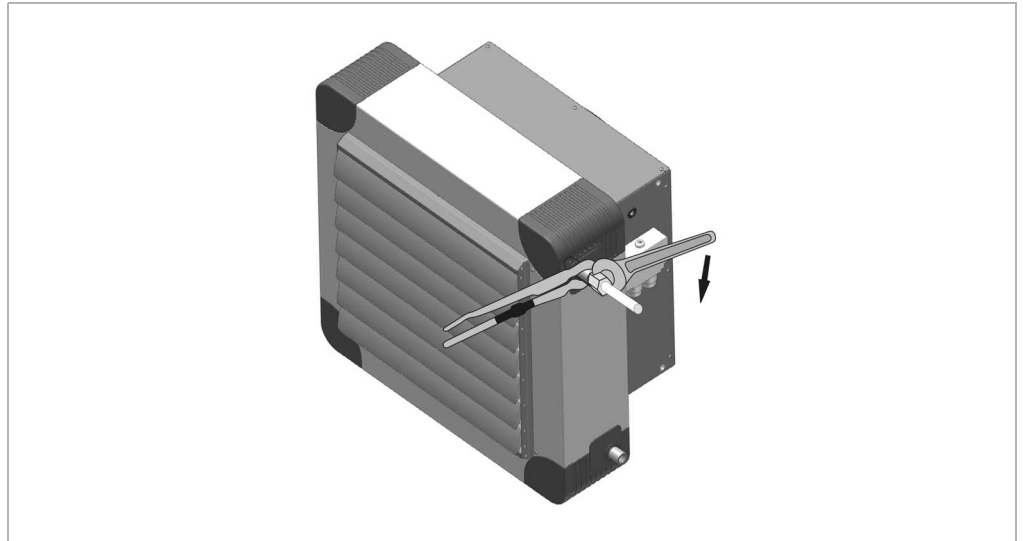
Connecting the medium connection pipe to heat exchanger connections
